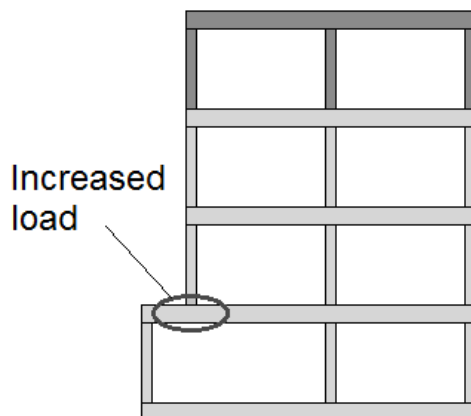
Situation when slab on lower floors can be affected by the extension through a horizontal shift).
